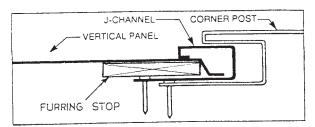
Installation of Panel Cut-in Bottom of V-Groove
